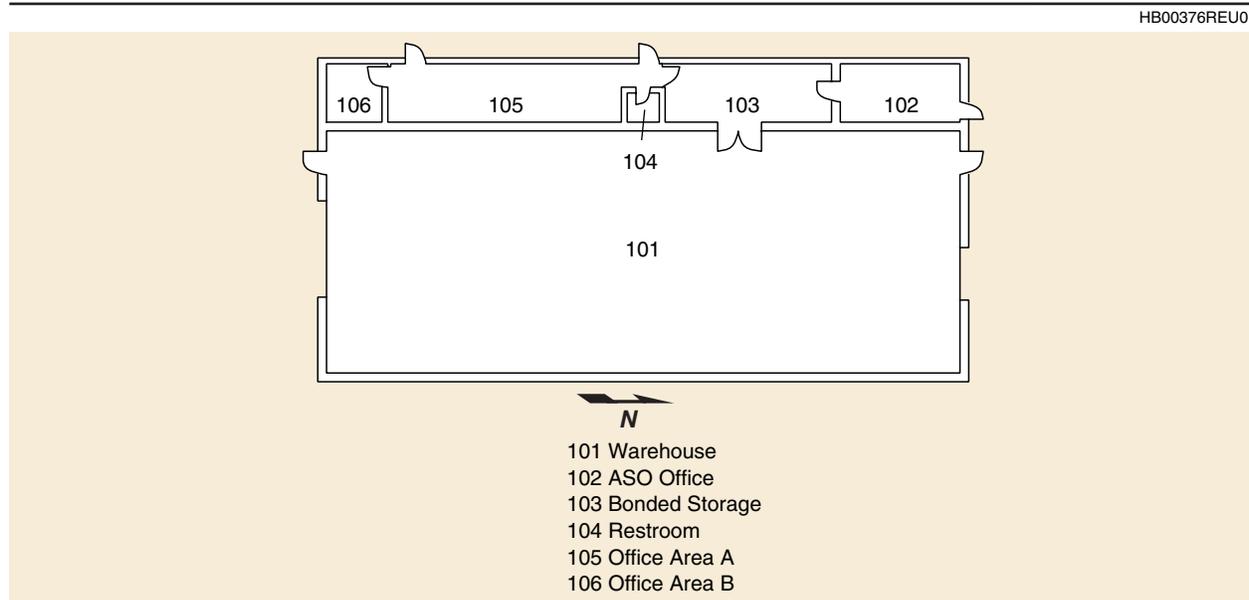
Building 4 Detailed Floor Plan, Astrotech
